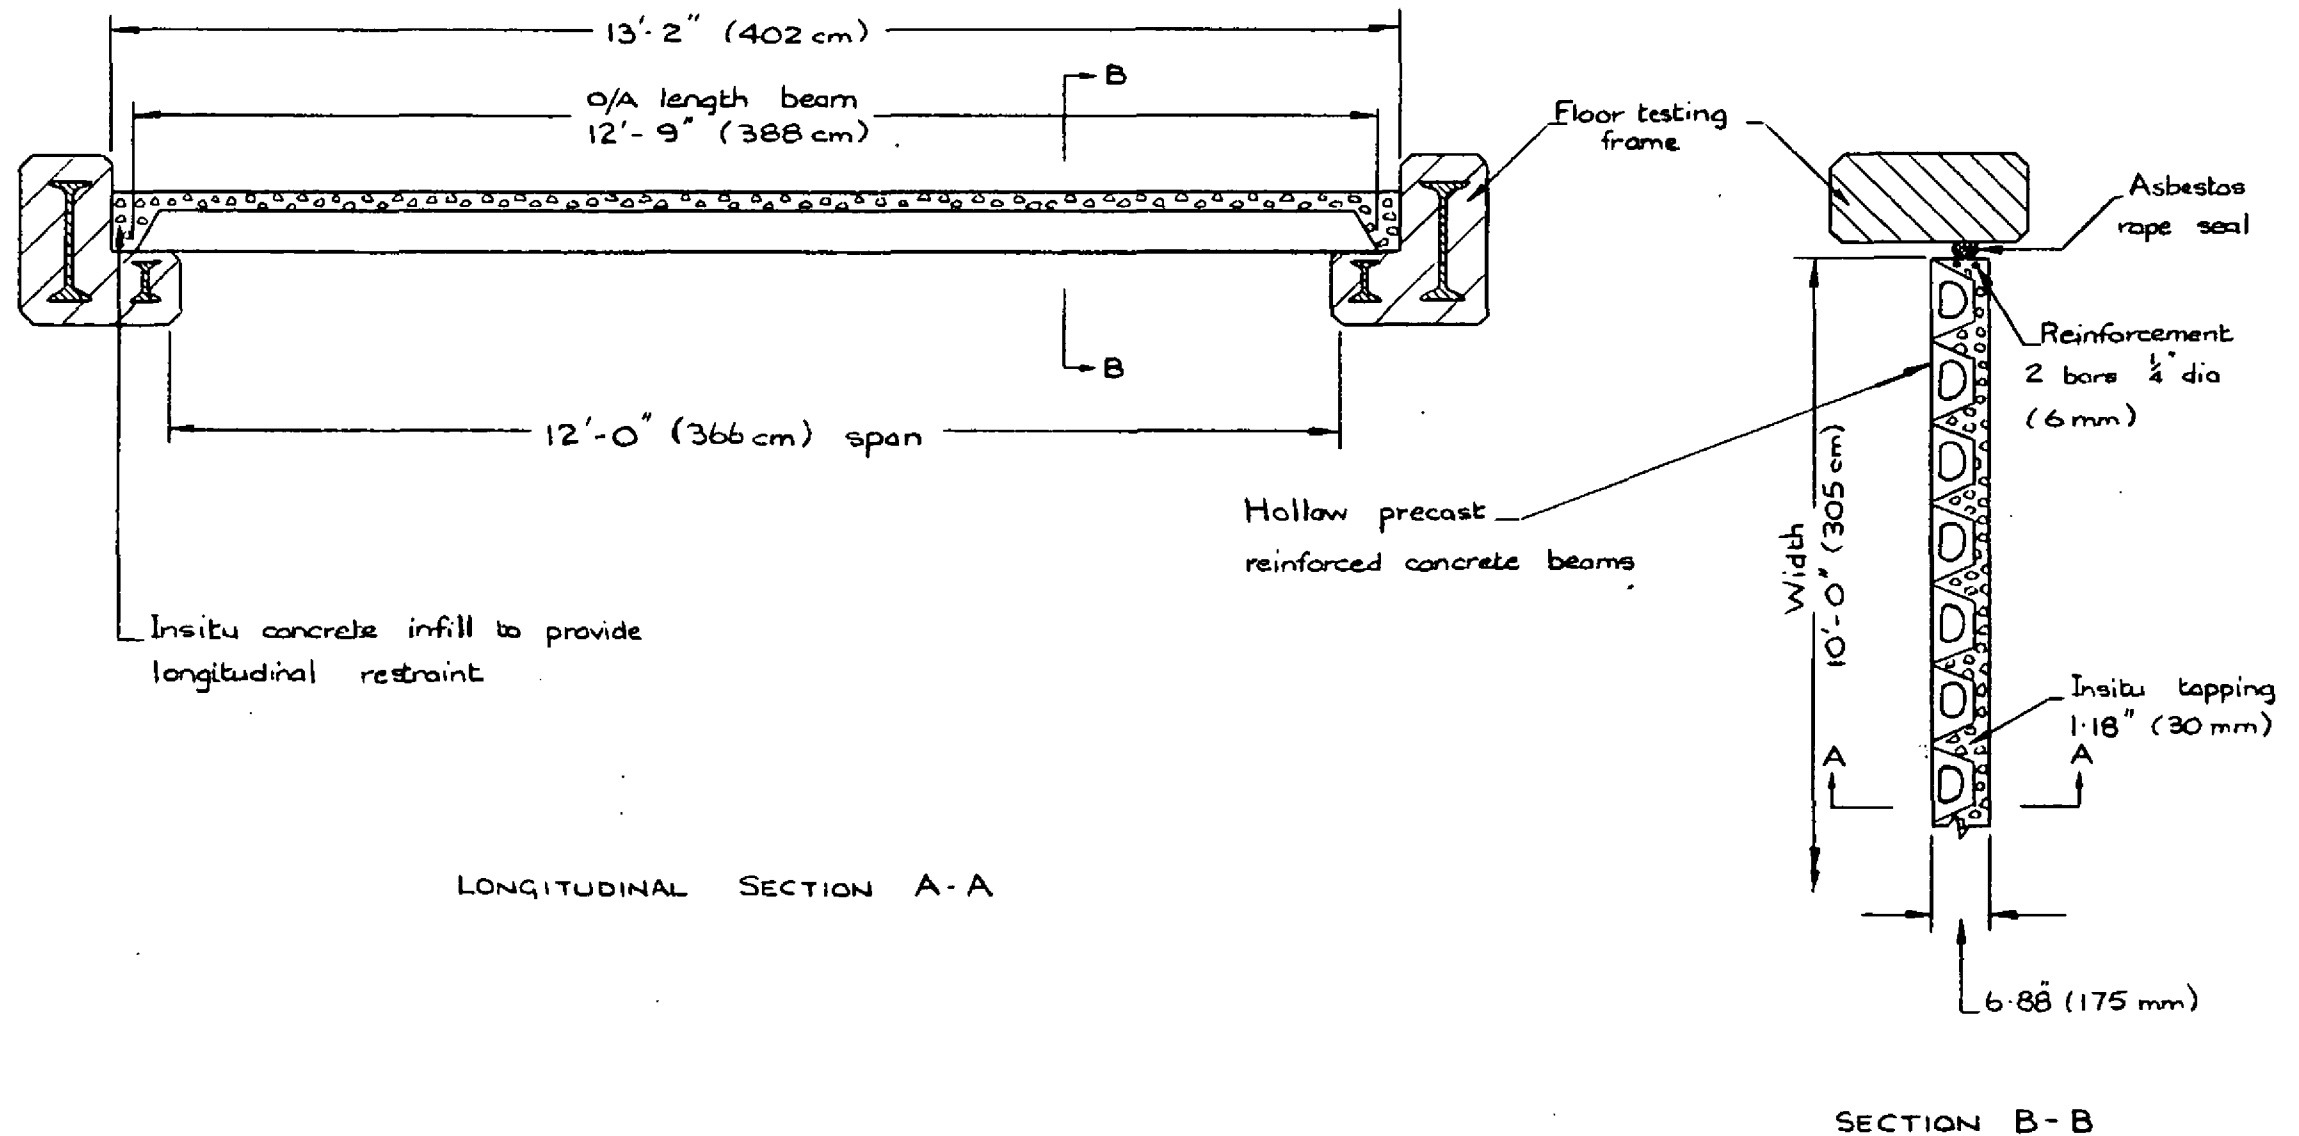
SPECIMEN NO. 2. CONCRETE FLOOR WITH LONGITUDINAL RESTRAINT
